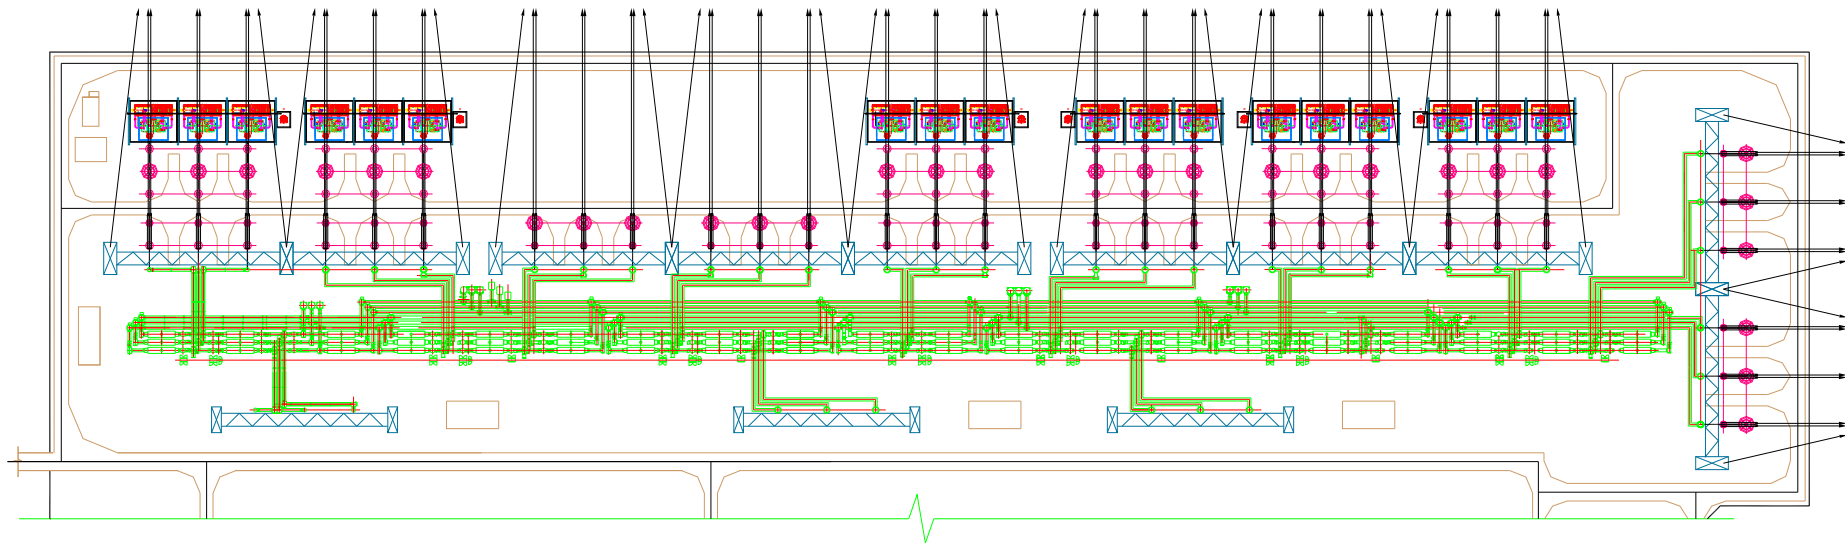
Layout of JinDongNan UHV Substation (One and half CB System)
